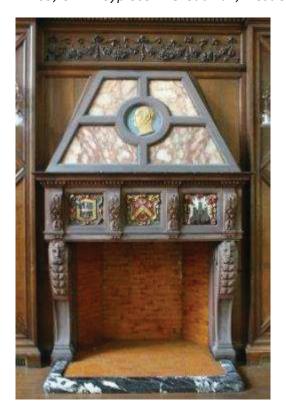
R 165, Great Hall, chimneypiece, west elevation
